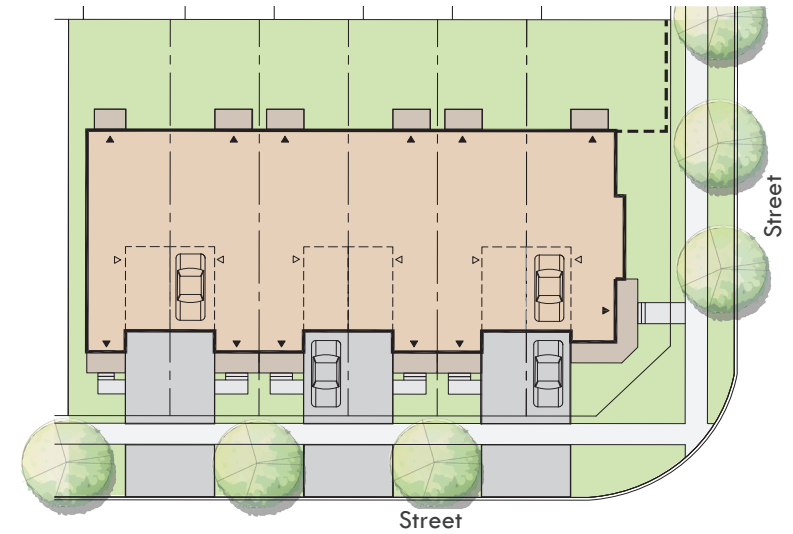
Conceptual Siting of Street Townhouses
